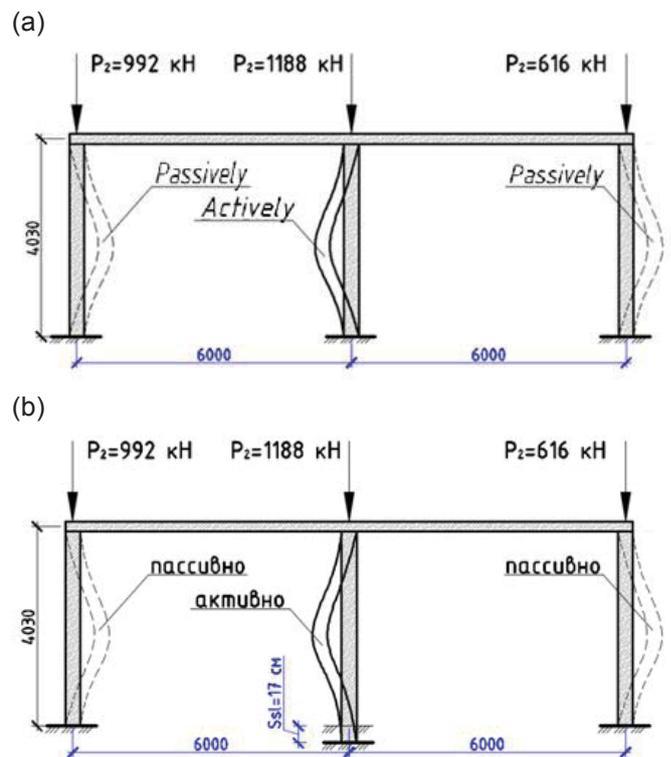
Finite element model for building frame (a); structural scheme конструктивная схема фрагмента каркаса здания (b)
